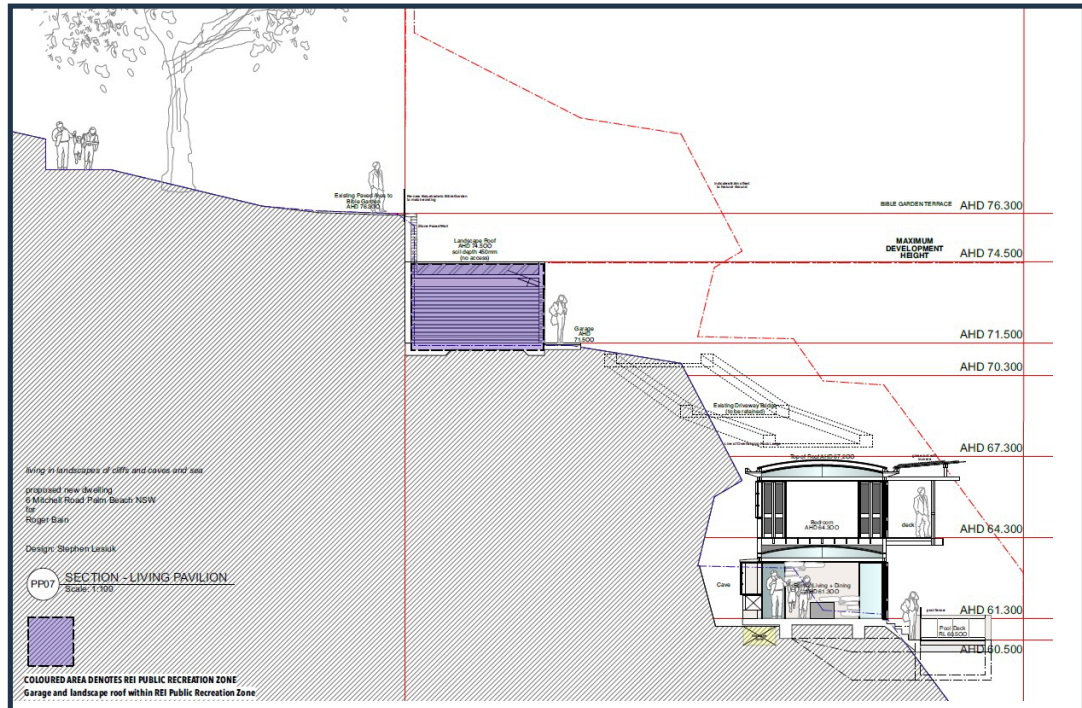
Concept Section detailing the garage as below the Bible Garden and height limit (Source: Housed Architects)
